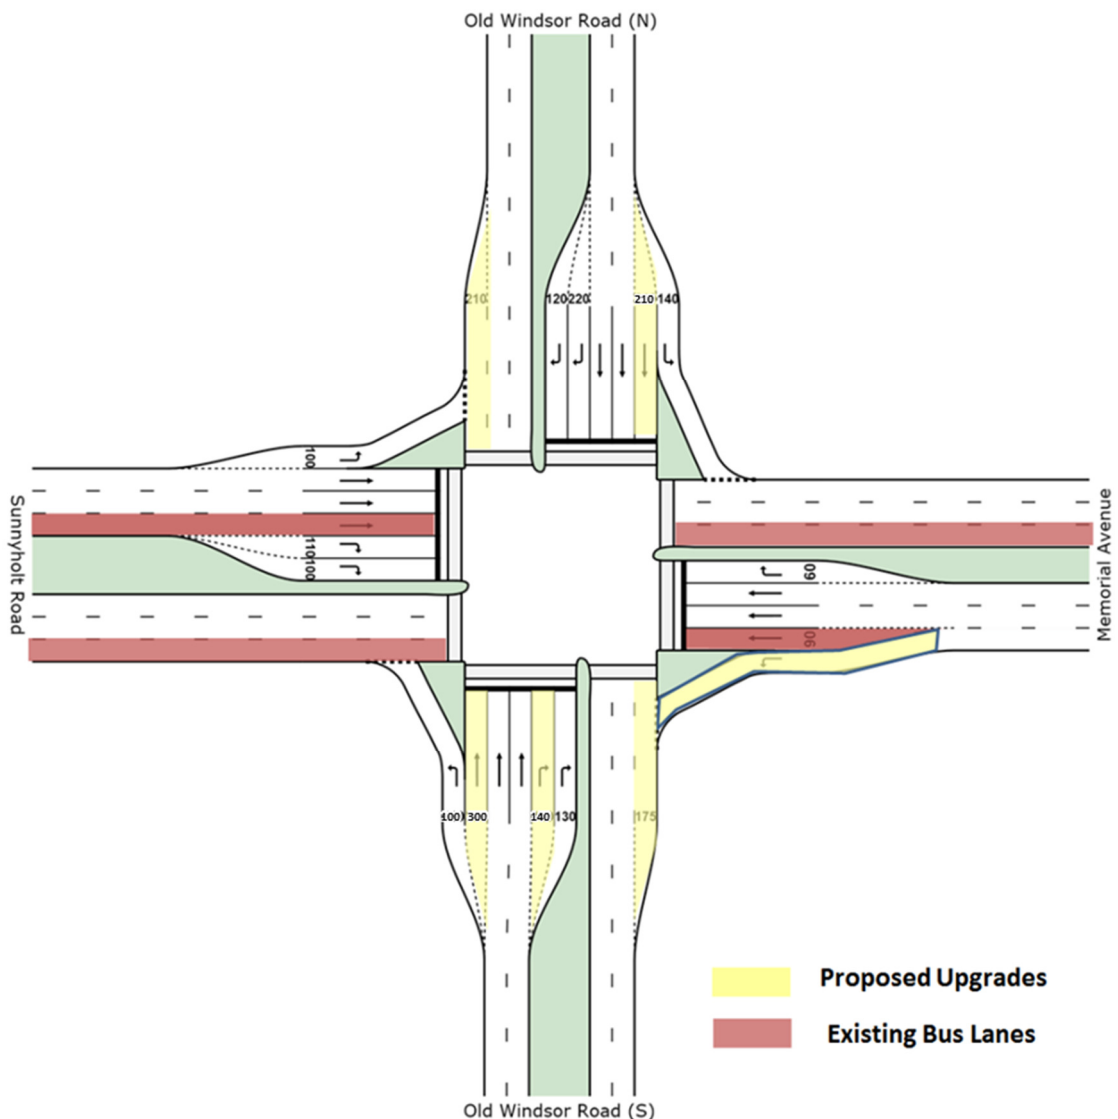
Proposed Layout of At Grade Upgrade at Old Windsor Road / Memorial Avenue/ Sunnyholt Road Intersection
